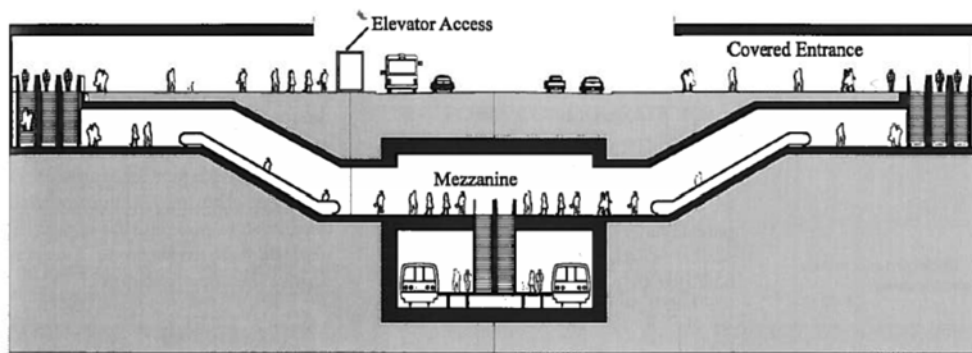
Schematic section of an underground cut and cover station with two entrance structures (Griffin, 2004).
